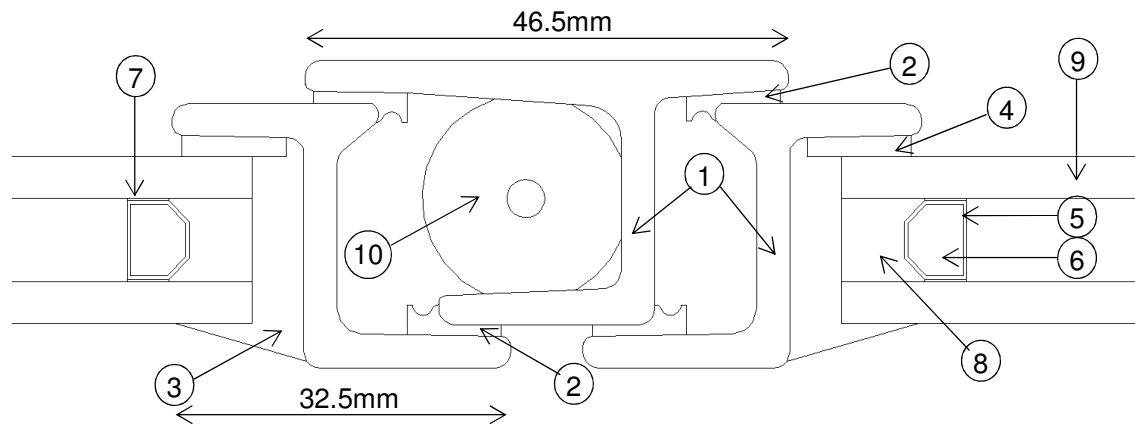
Technical drawing of Head/Jamb/Sill profile.
